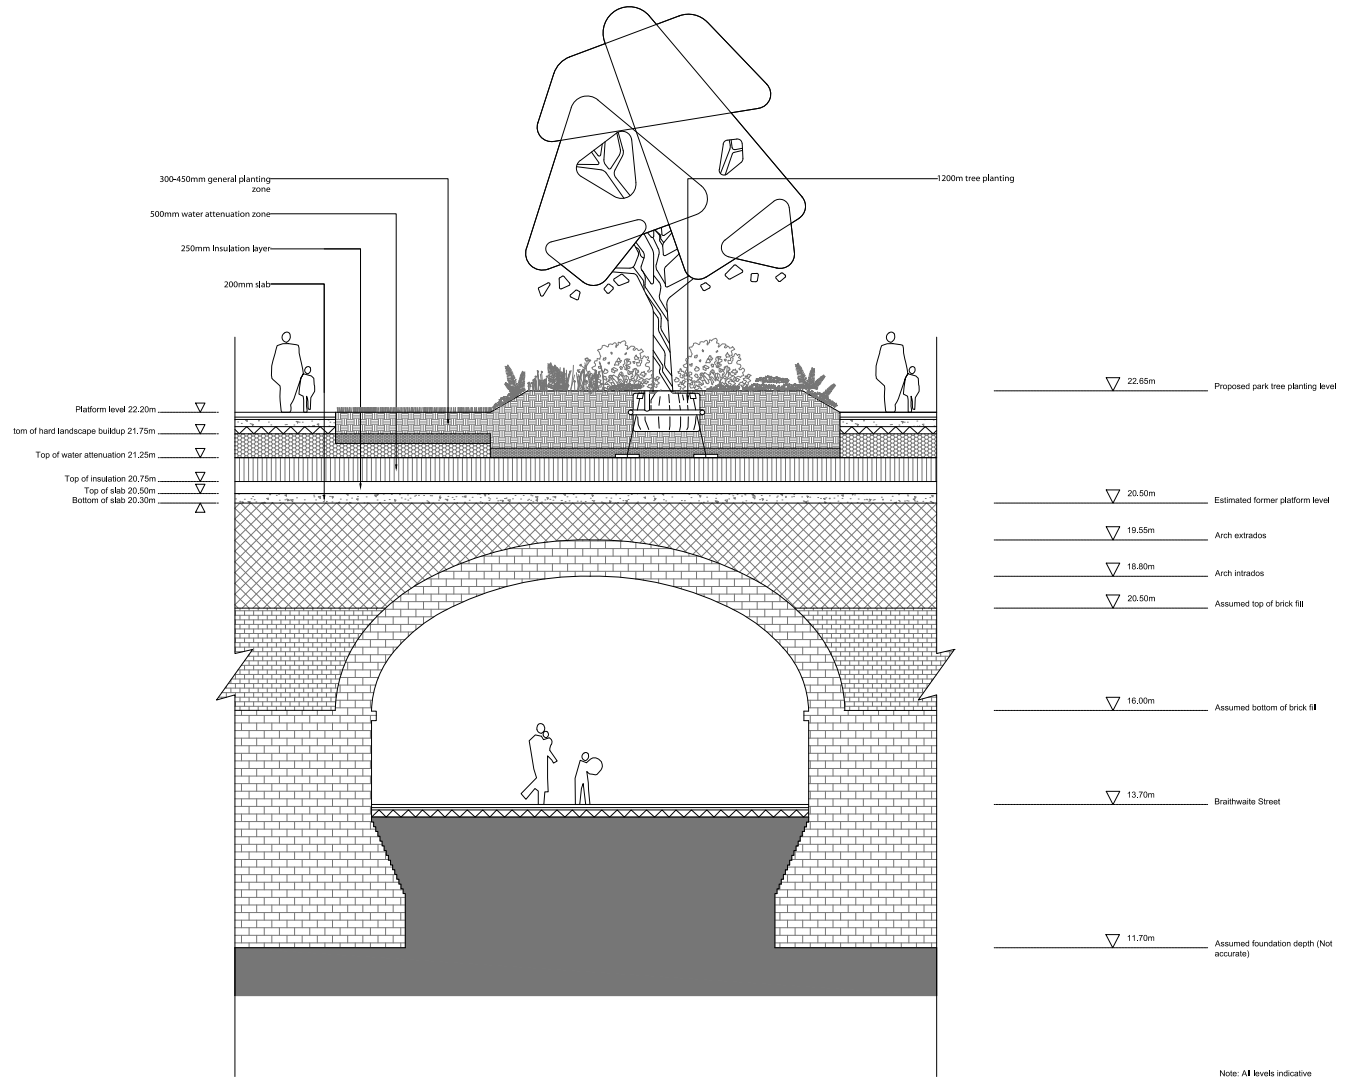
Typical public realm and landscape build up over Braithwaite Arches (west end)
